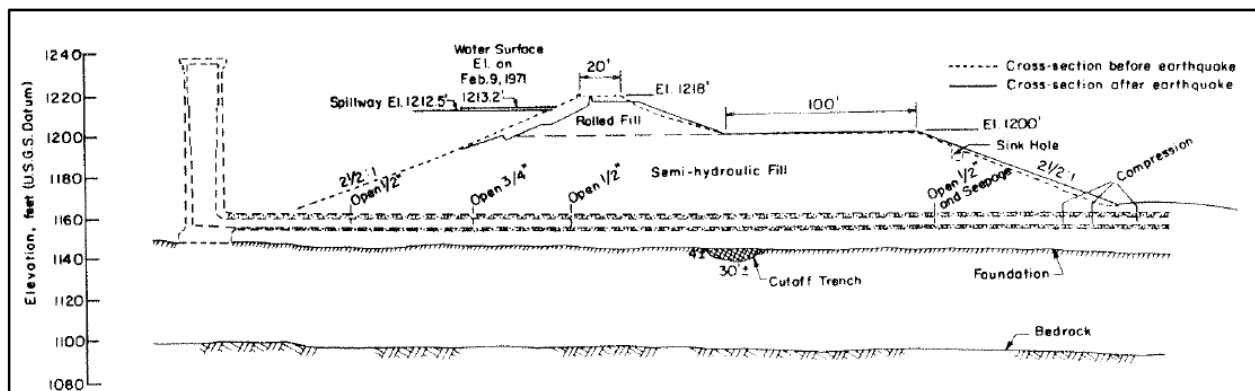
Cross section through the Upper San Fernando Dam (L.A. Department of Water and Power) (Seed et al., 1973)
